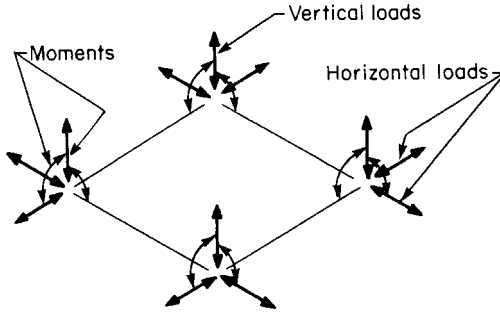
Typical loads acting on foundations for four-legged framed structures.
